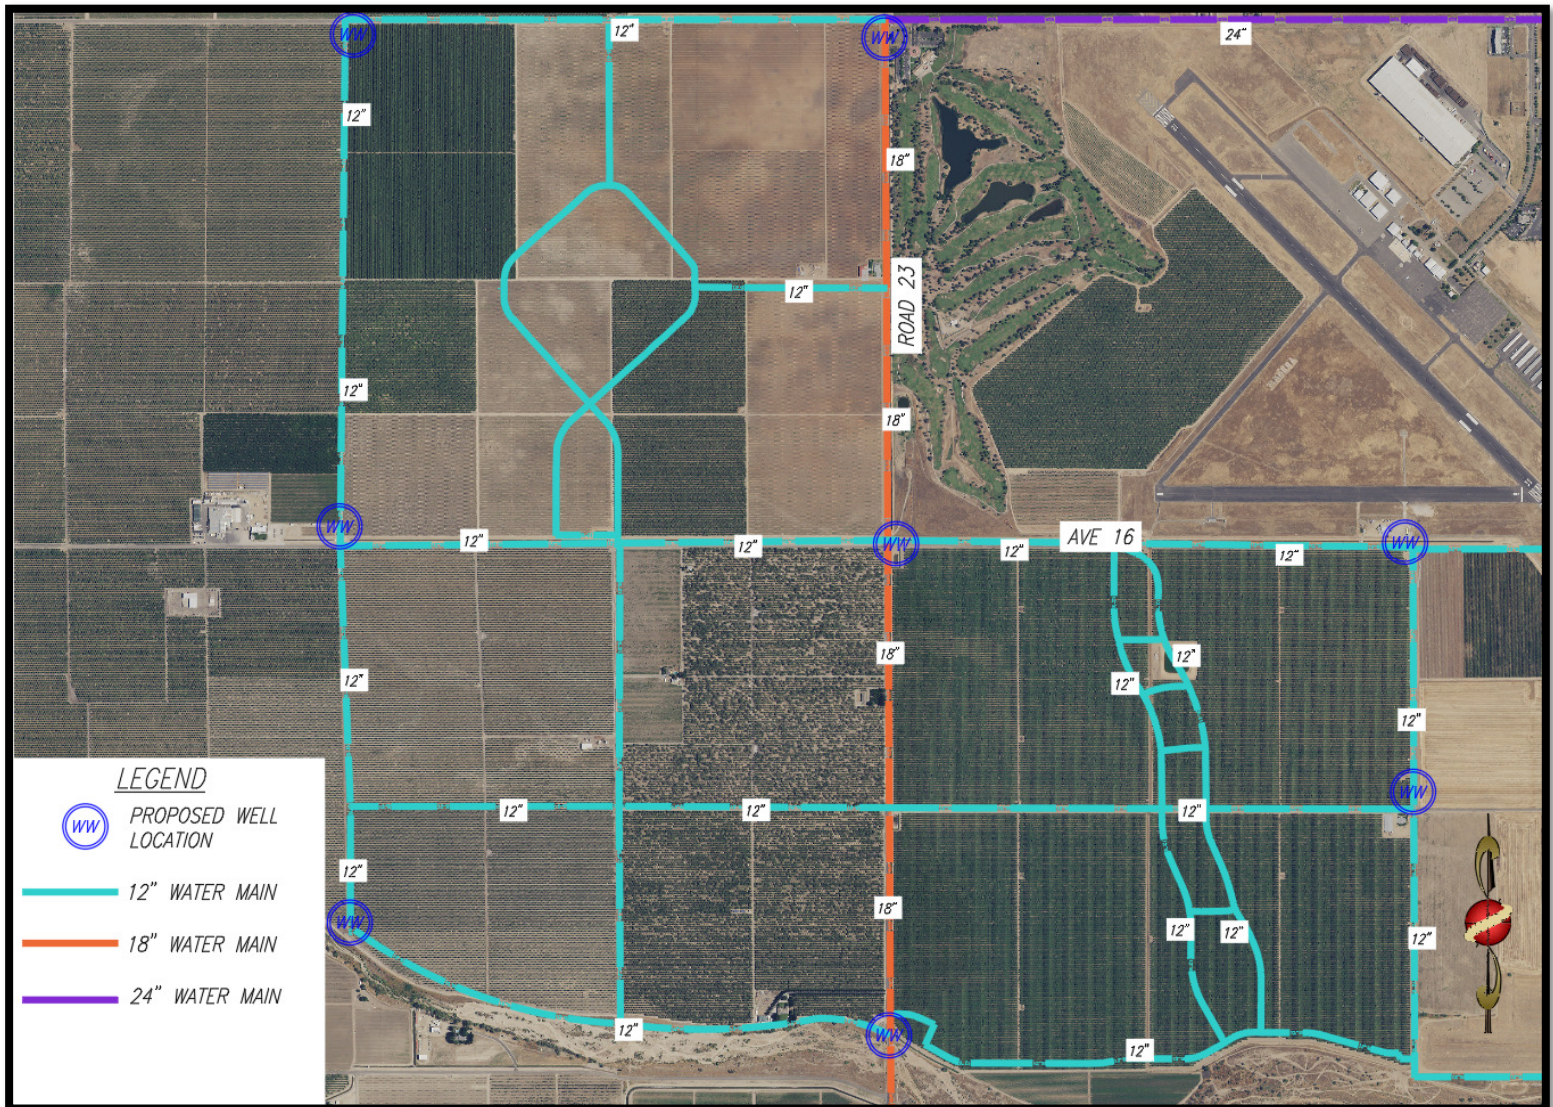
2 illustrates the major water facilities proposed for the Project. The proposed master plan, distribution system, and pipe sizes, were developed based upon the proposed Land Use Plan in Table 2- 1 and the WSMP. Adjustments to the Land Uses will require modifications to the water system master plan based on approval of subsequent development entitlements that finalize residential densities, neighborhood commercial, recreational and office use.
